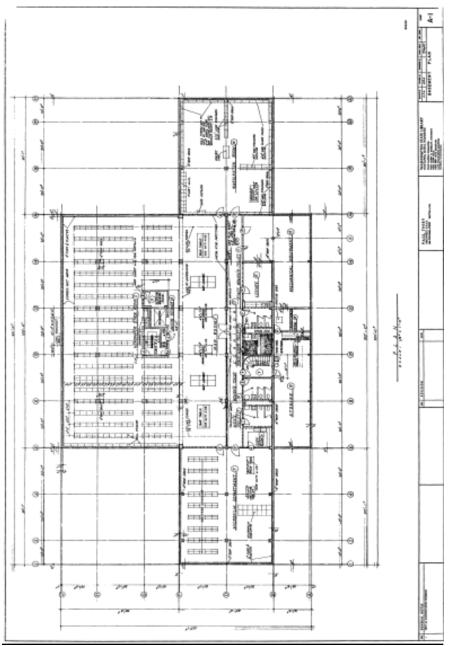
1957 Basement floor plan prepared by Paul Thiry. Drawing courtesy of the Washington State Department of General Administration Archives.
